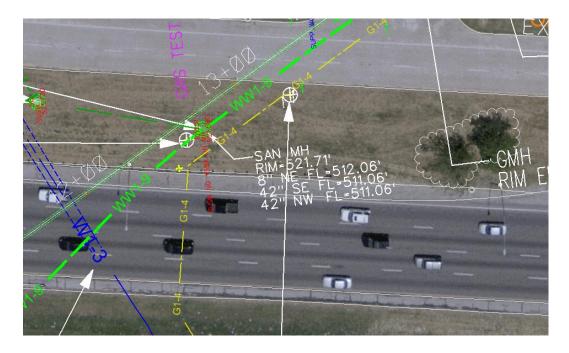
Detail - Intermediate existing Manhole flow lines to extrapolate south tie-in elevation.
